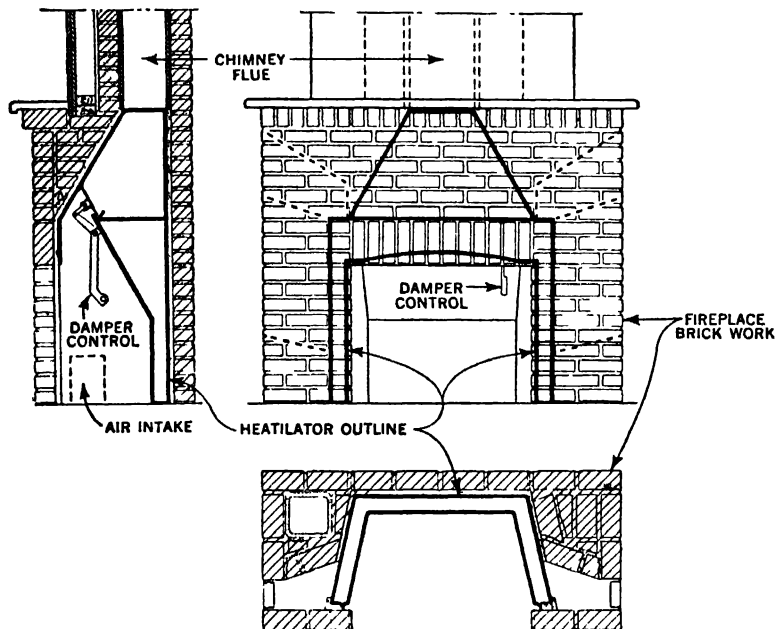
Showing a prefabricated modified fireplace of the *heatilator* type.
